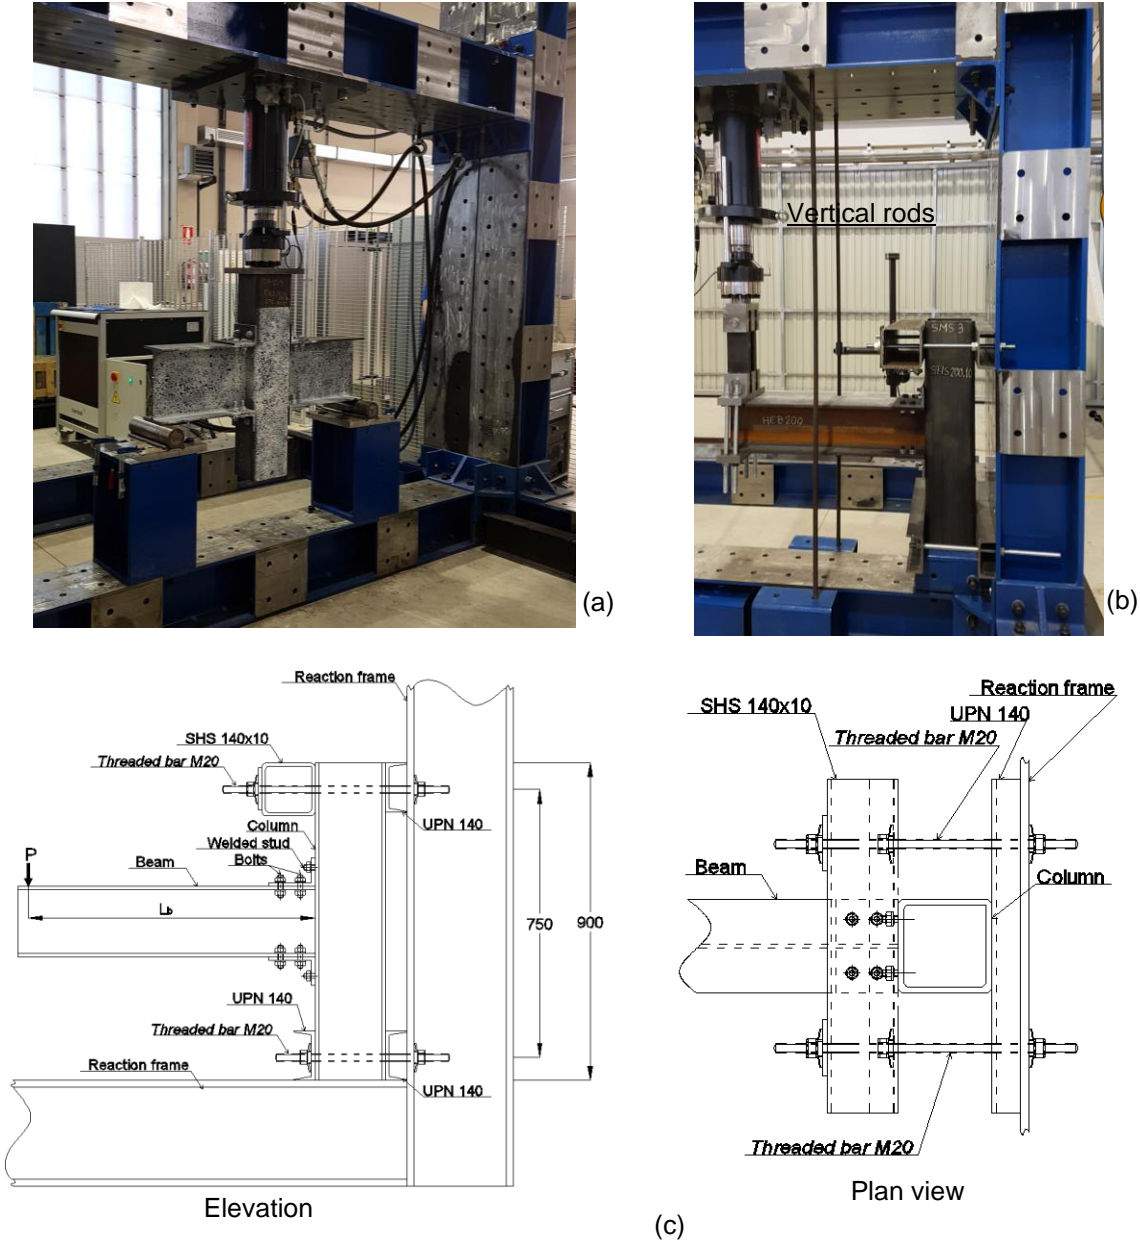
General set-up of tests for joints. (a) Double sided specimen (DMS4). (b) Single sided specimen (SMS3) (c) Sketch of the horizontal restrain system.
